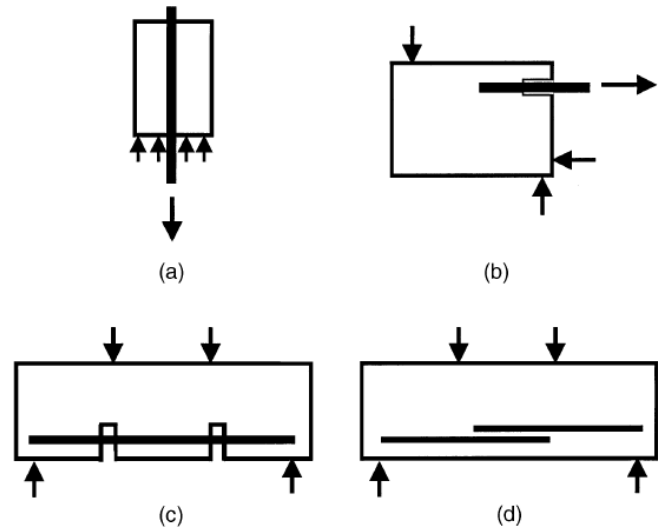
Basic Schematic of: (1) pullout specimen; (b) beam-end specimen; (c) beam anchorage specimen; (d) splice specimen [56]
